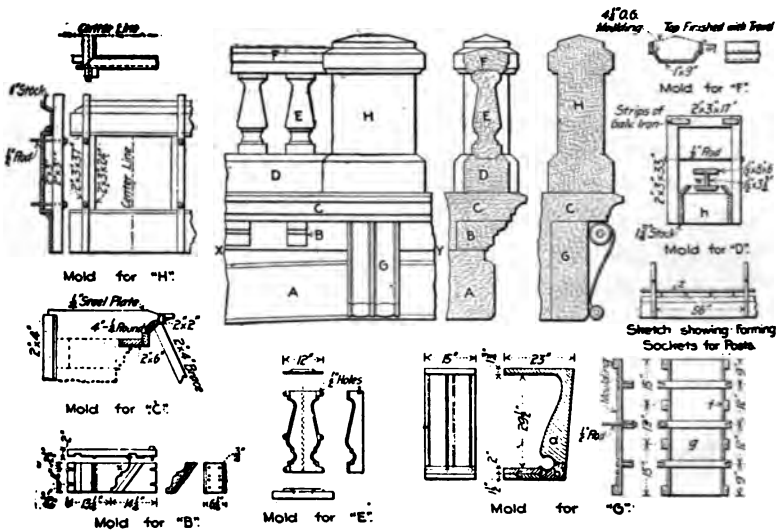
Details of Railing and Forms, Grand River Bridge.
